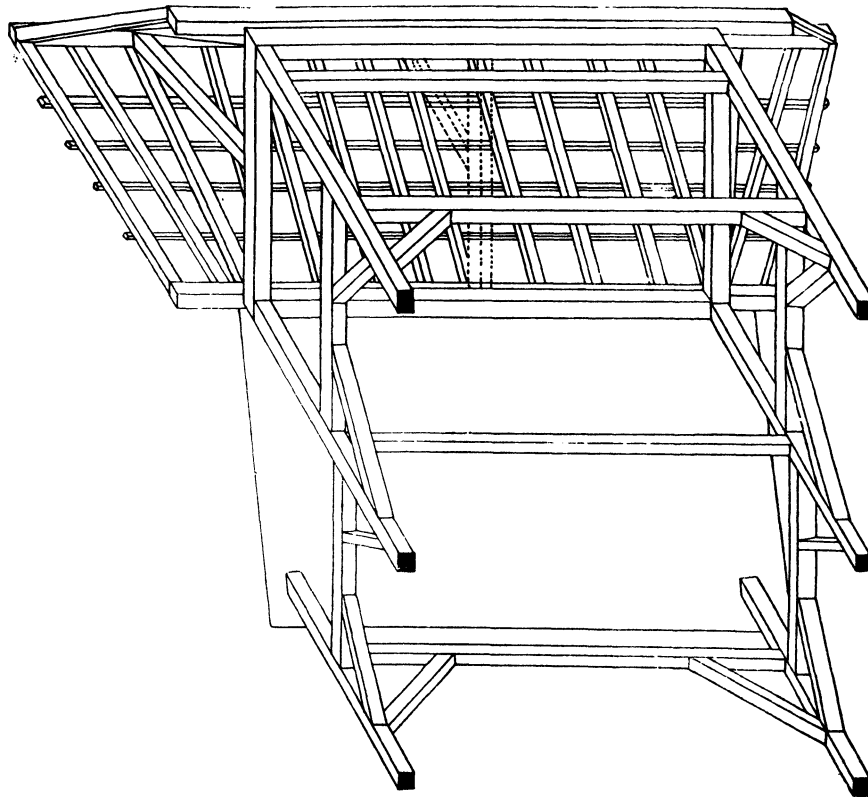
Reconstituted beamwork of the building shown in Prambanan Temple, north balustrade, west side, central panel: see figure 2 (MA8).
